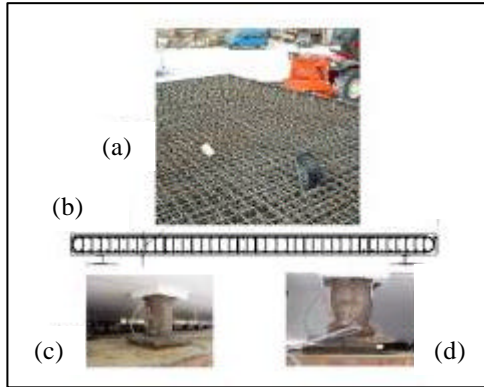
(a) Reinforcement steels of SDR-slab, (b) cross-section of SDR-slab on its supports, (c) Undamaged support, (d) Support damaged by impact load on slab side.
